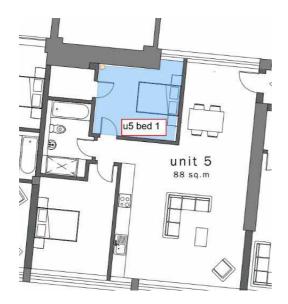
Unit 5 bedrrom1 - Extract from floor plan - drawing number 1600529.2. drawn by AC at Marrons
